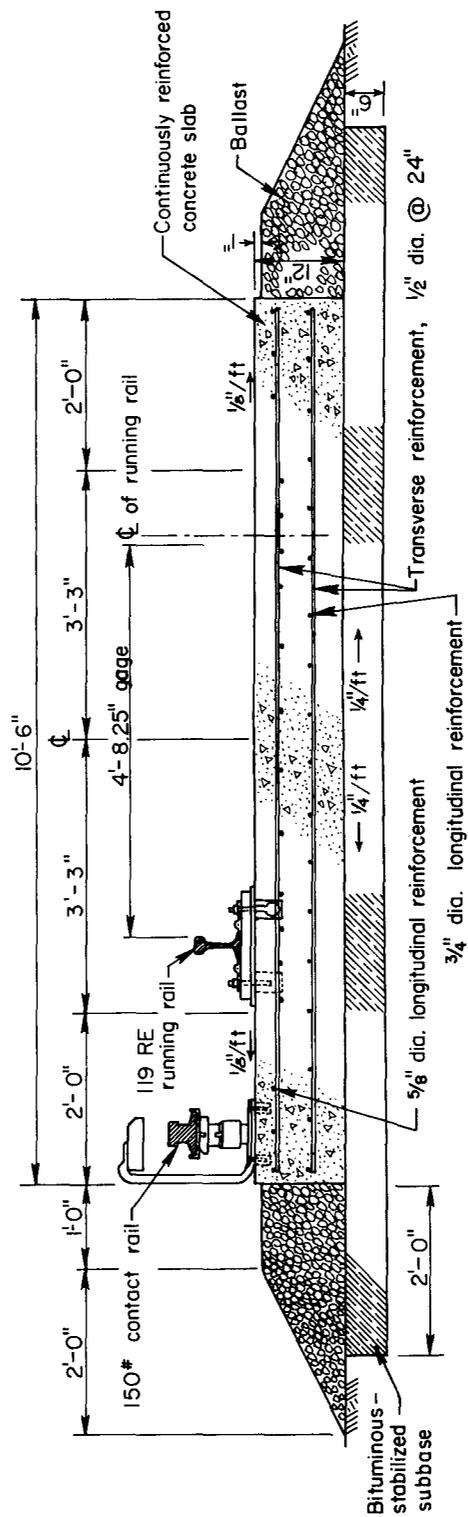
CROSS SECTION OF SLAB TRACK ON THE LONG ISLAND RAIL ROAD
